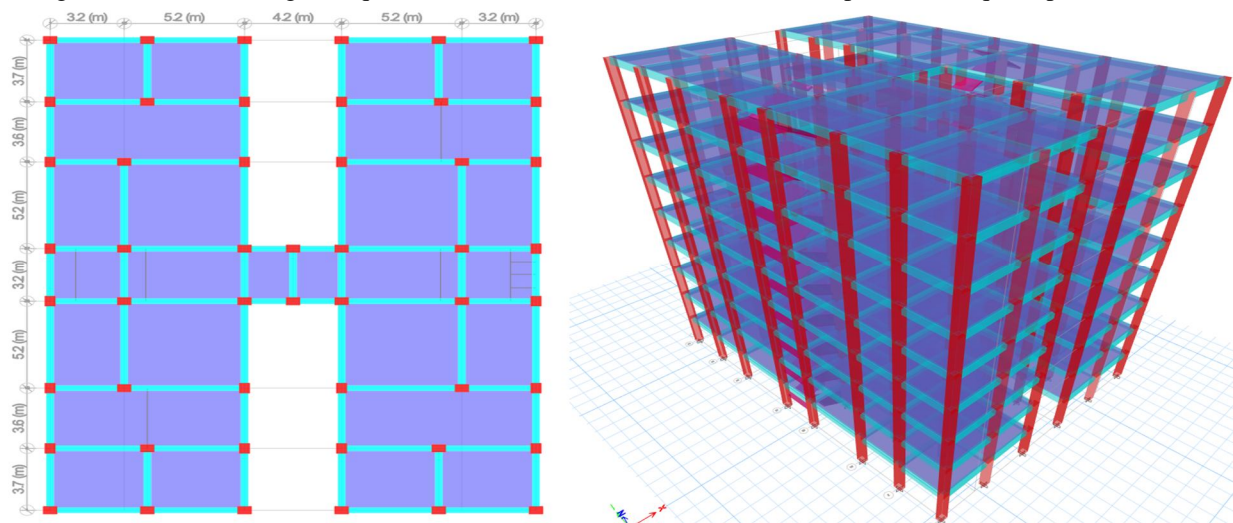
(a) Plan view of G+8 Residential building model (b) Isometric view of (G+ 8) Residential building model
